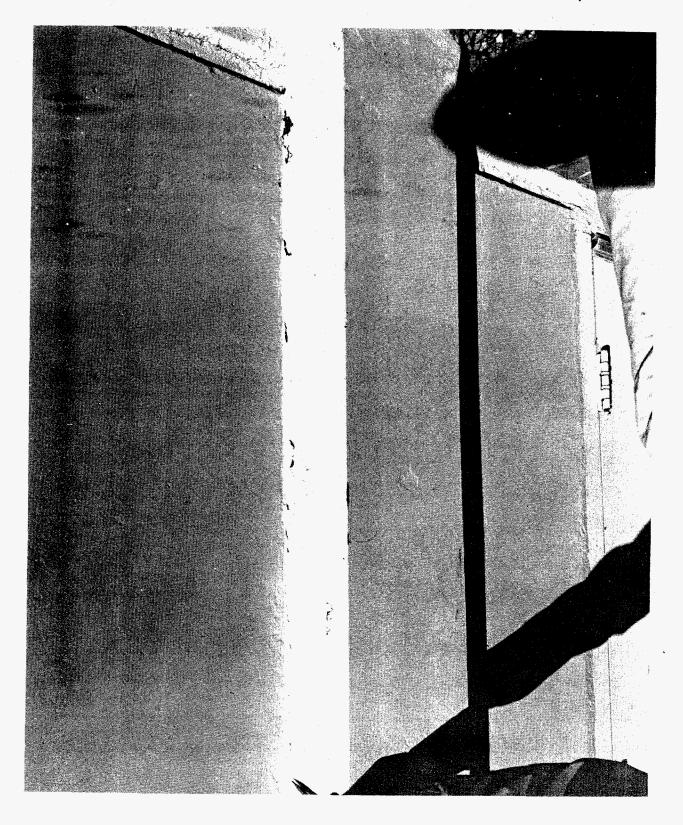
Building 725, south side, additional spalling at panel-post junction, intermediate inspection.
